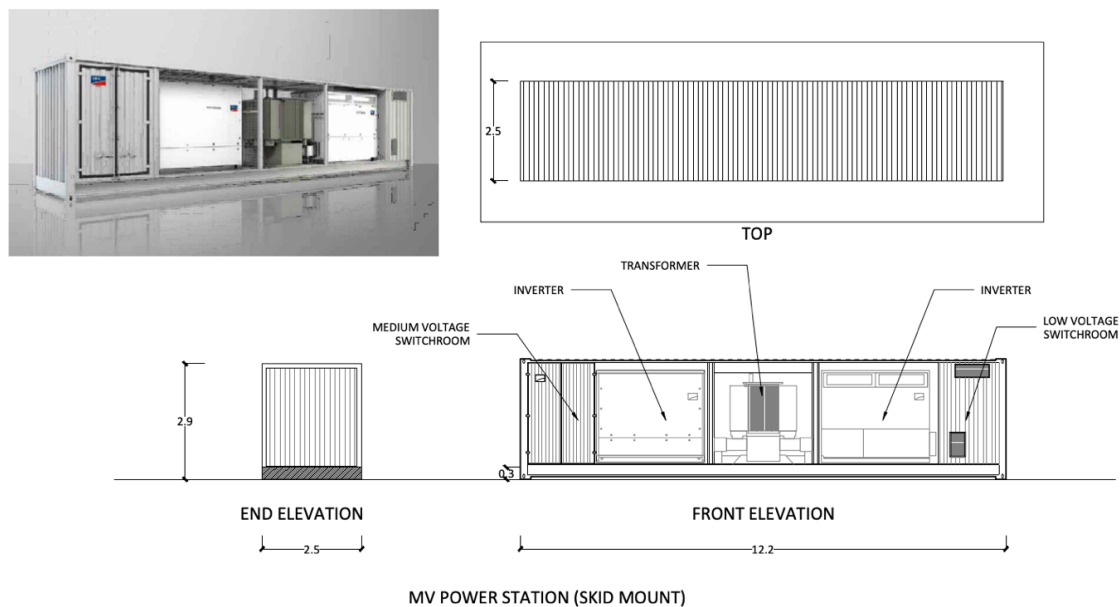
Elevations showing the proposed central Power Station unit containing the transformer and inverter for connection to the 22kV power line
